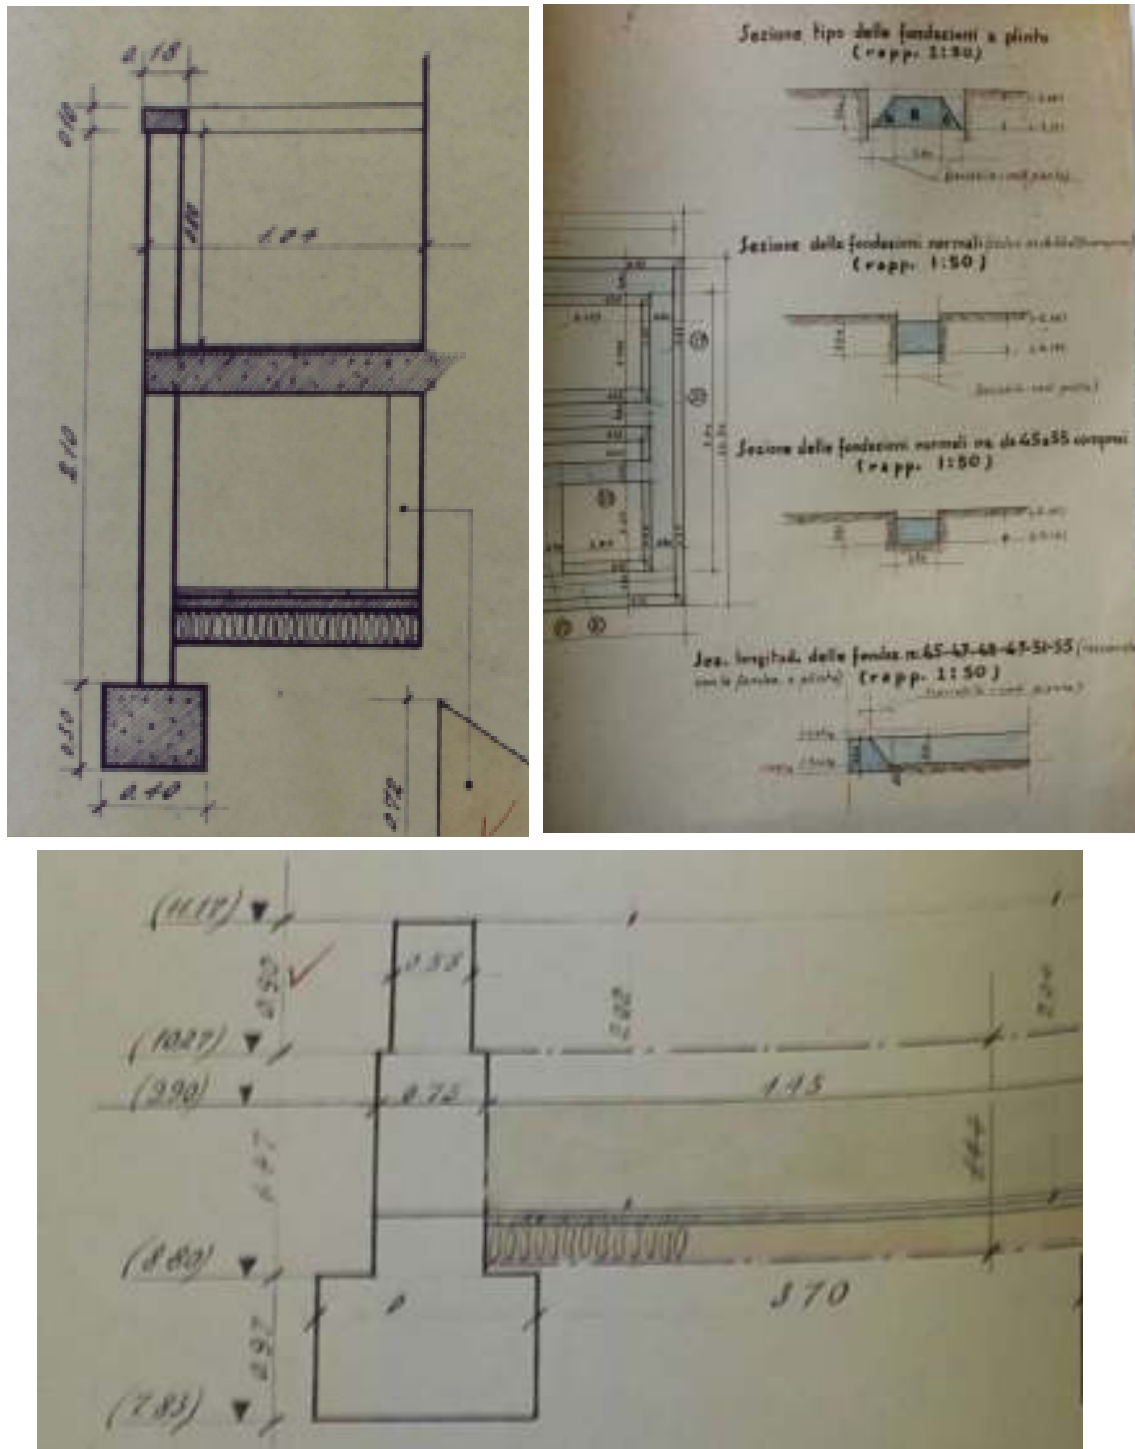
Details for the foundations of the investigated masonry buildings (source RFI archive).
